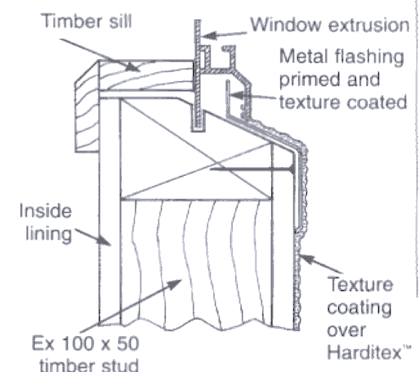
SILL DETAIL (ALTERNATIVE 3)
